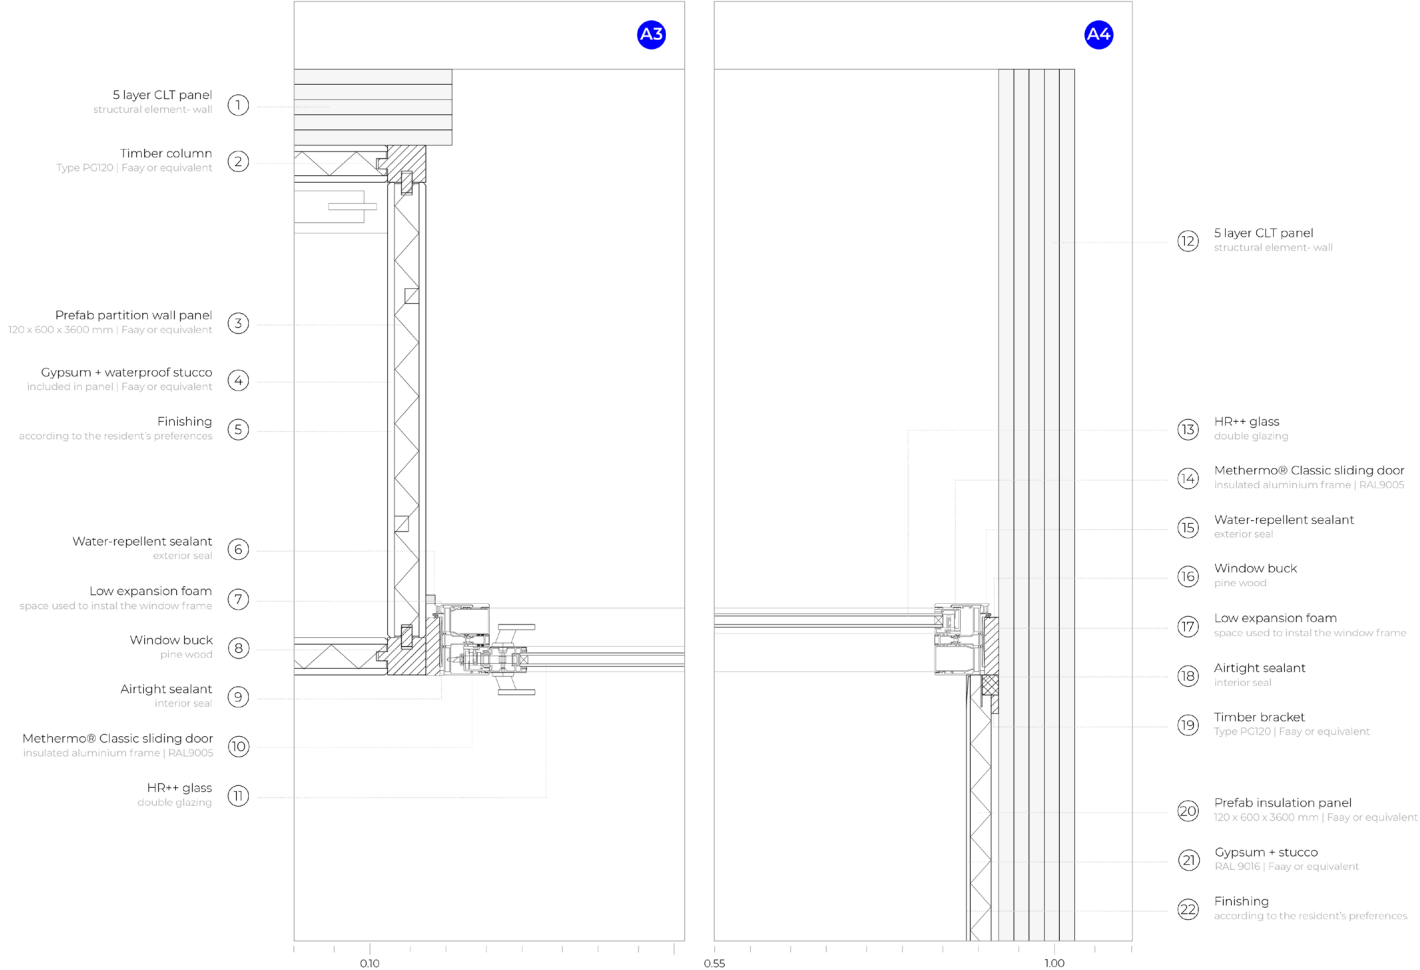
# DETAIL DRAWINGS | HORIZONTAL SECTION A | SCALE 1:10
